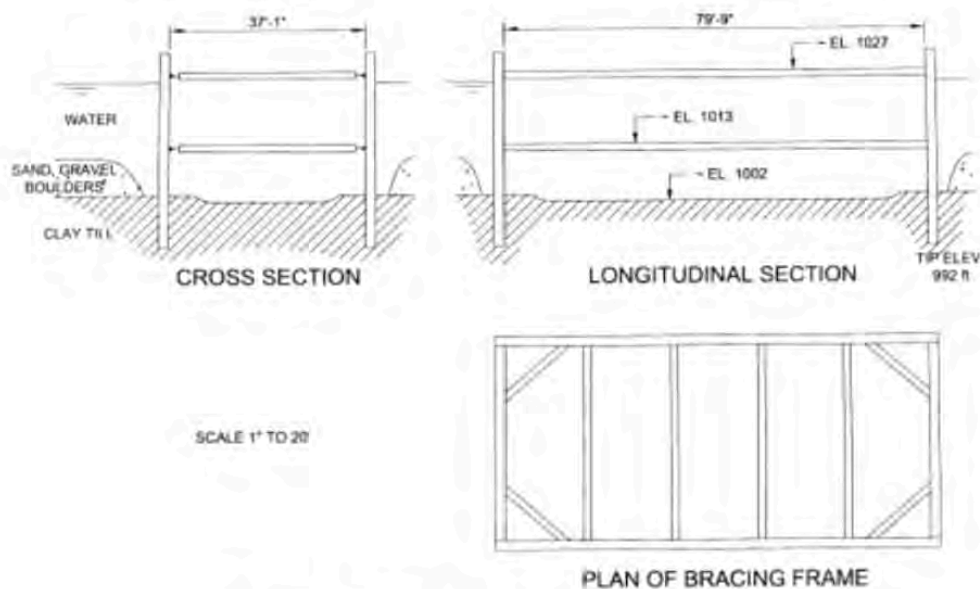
Failure of a Cofferdam, Plan and Sections
